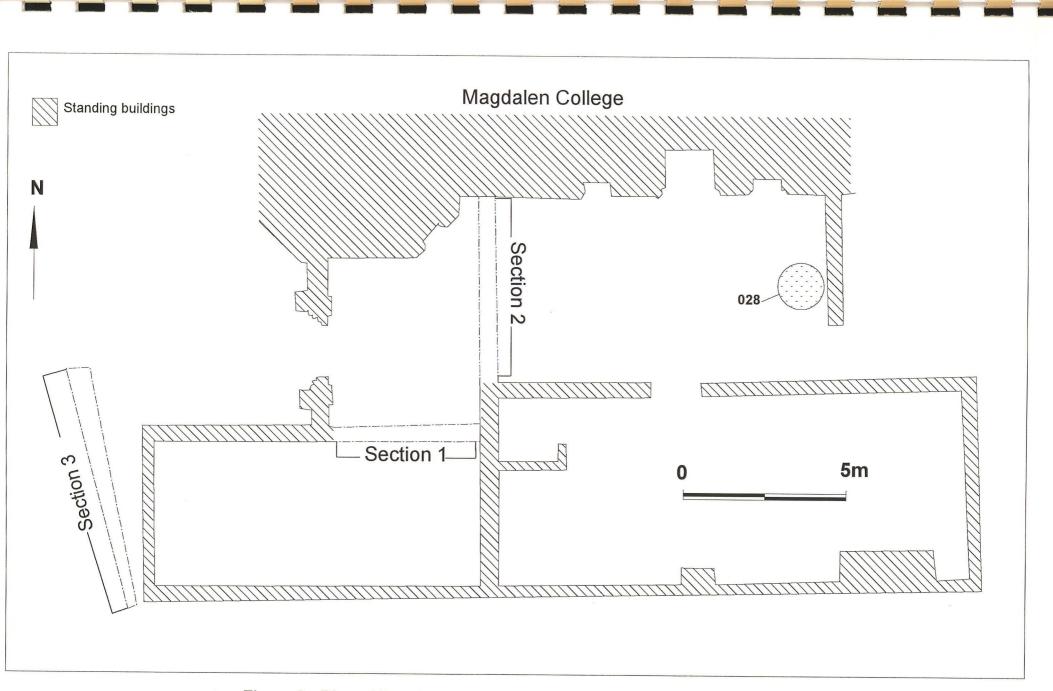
Plan of Development, showing location of Sections 1, 2 and 3
